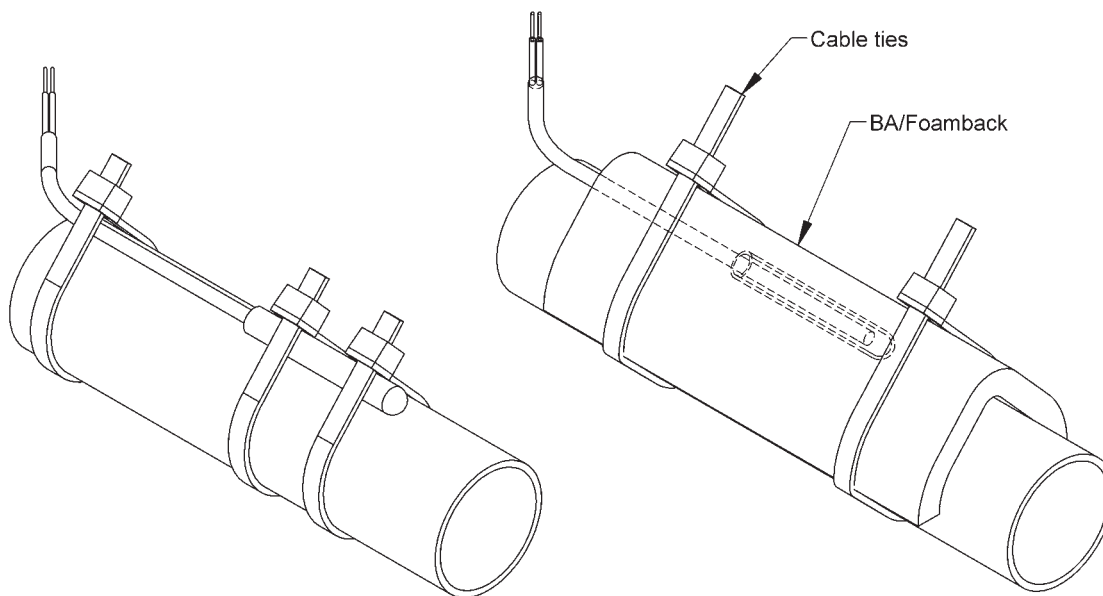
Remote probe with FEP jacketed cable strapped directly to pipe.
